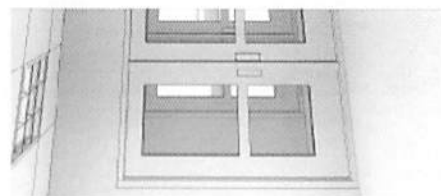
EXHIBIT D: DRAFT INTERIOR DESIGN PLANS – LOBBY AREA AND CLIENT SERVICE ROOMS
